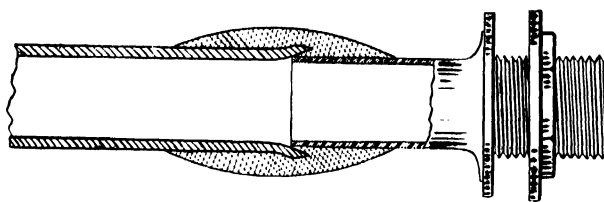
CISTERN CONNECTION WITH SINGLE-NUT BOILER SCREW
